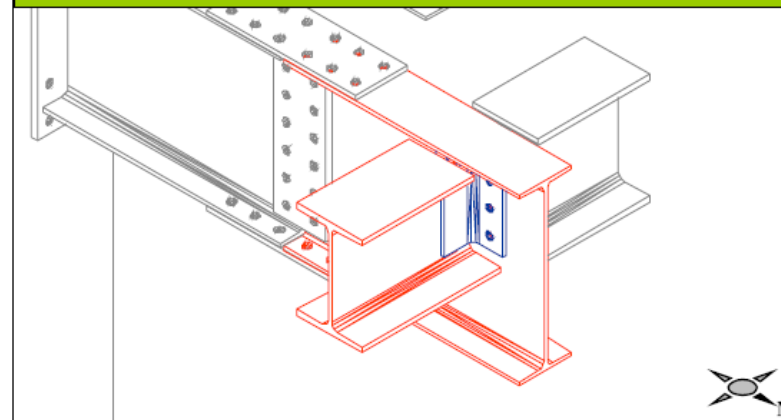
Shear Connection: Bolted-welded double-angle Girder B3 / Beam B3A
